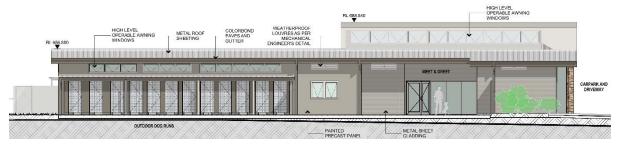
B: Animal Shelter building, NE Elevation – DA approved outdoor enclosure façade (source: F&J Tepa)
